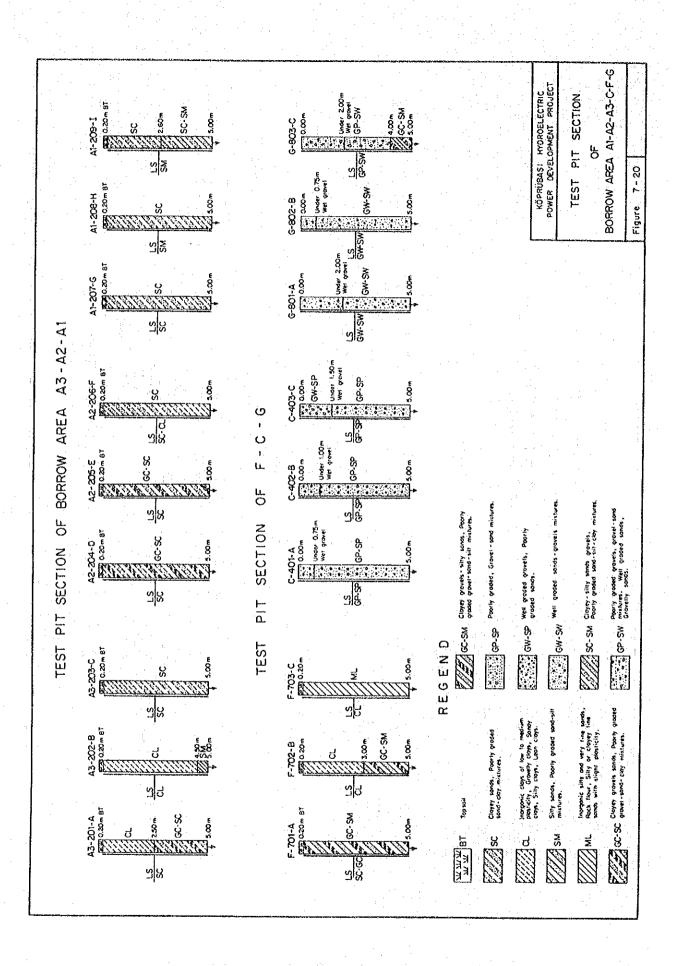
Test Pit Section of Borrow Area A1, A2, A3, C, F and G
